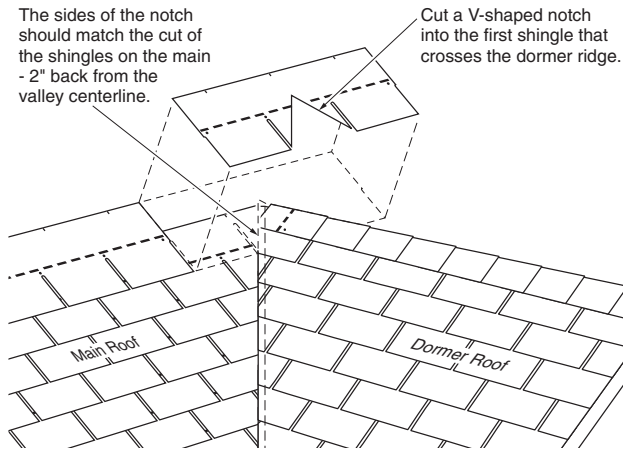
The V-notched shingle being fitted over the dormer ridge.
